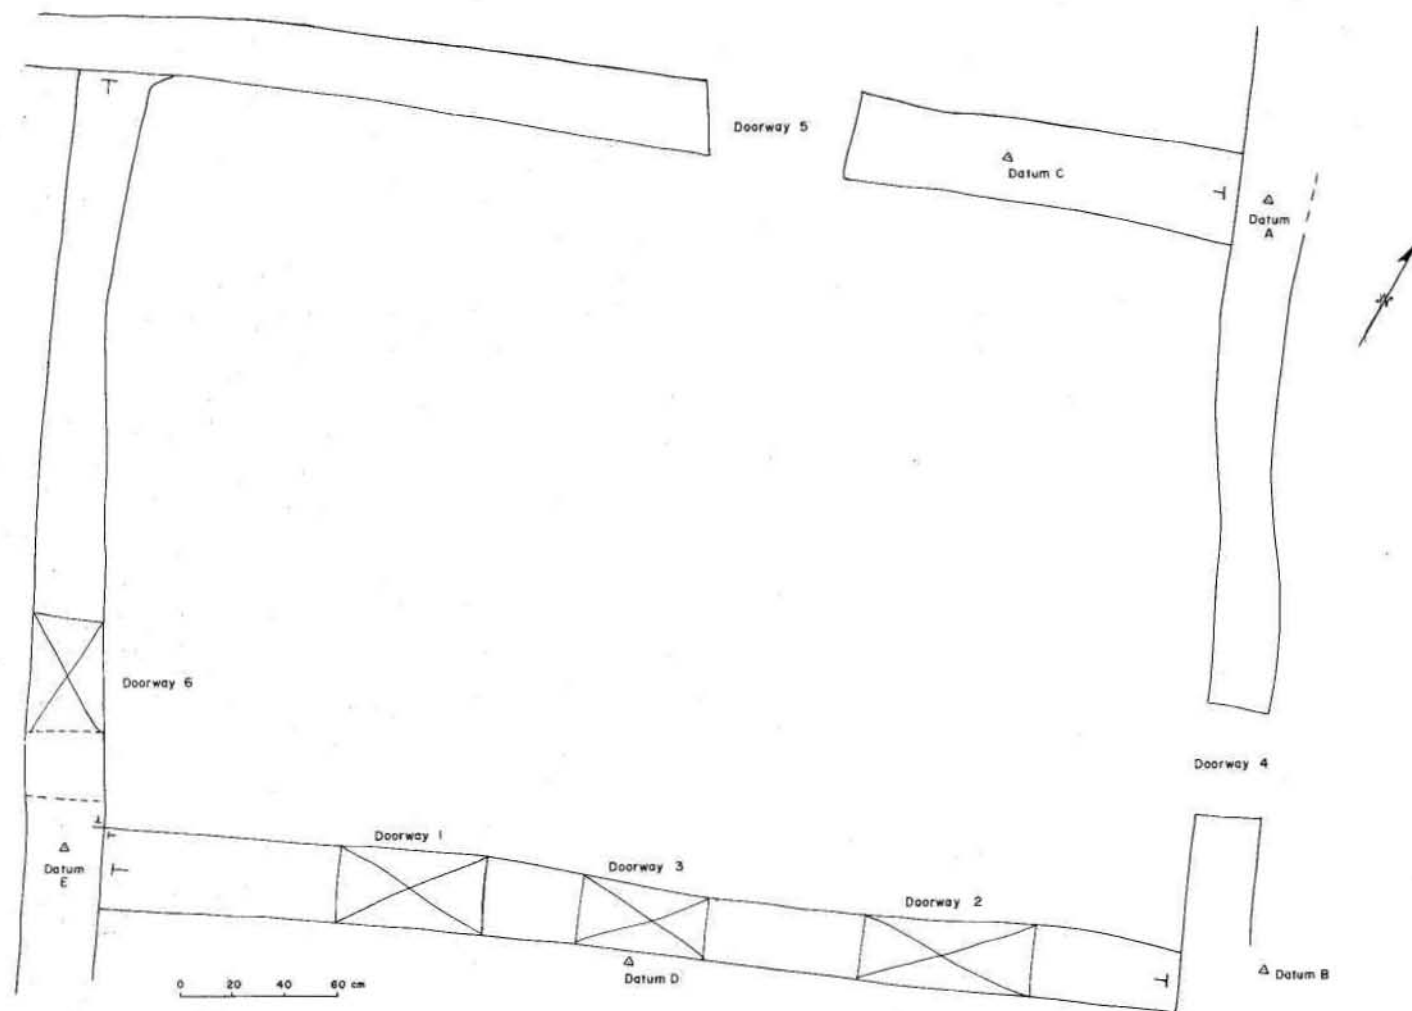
Plan view of Room 7 with location of datums and plugged and unplugged doorways
